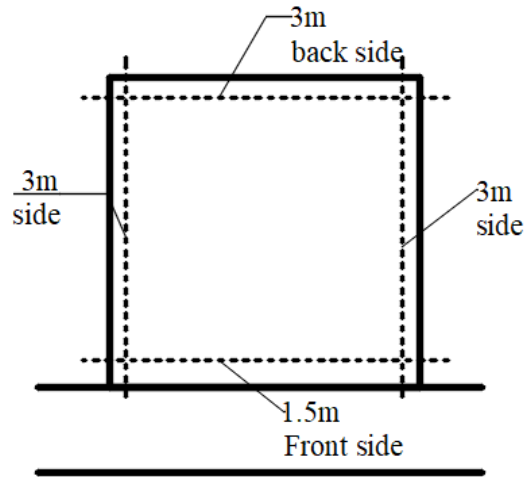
Diagram showing Setback in a commercial plot having 10 storied or above (as per Building Construction Act, 2008)
